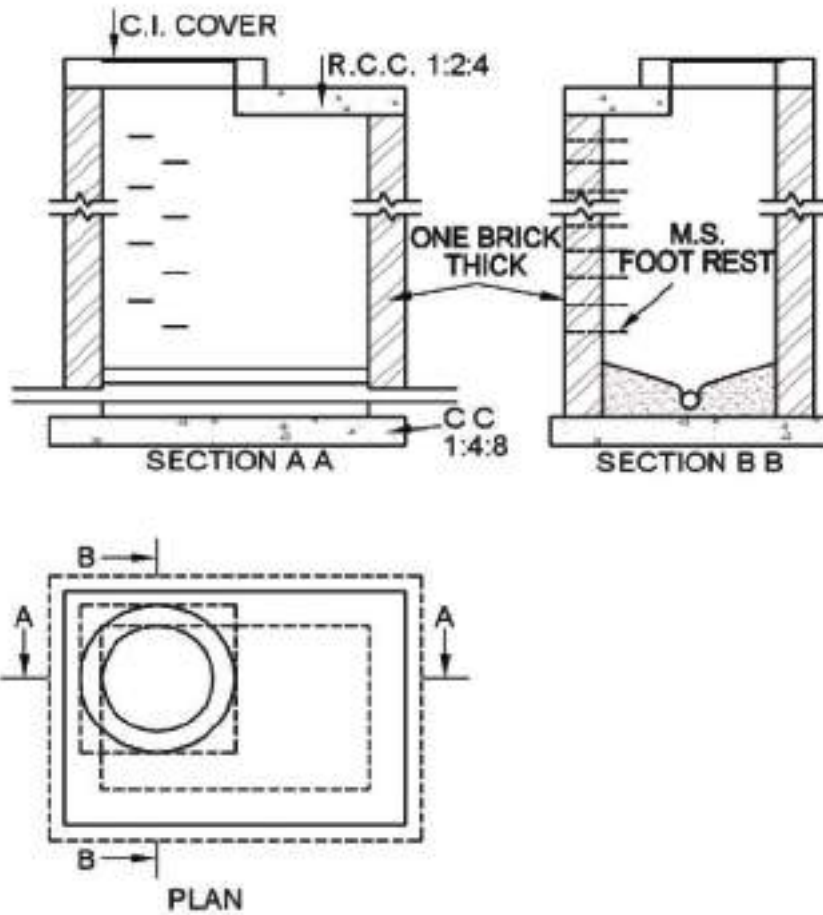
Rectangular manhole for 0.9 m × 0.8 m clear in plan and depth less than 0.9 m
